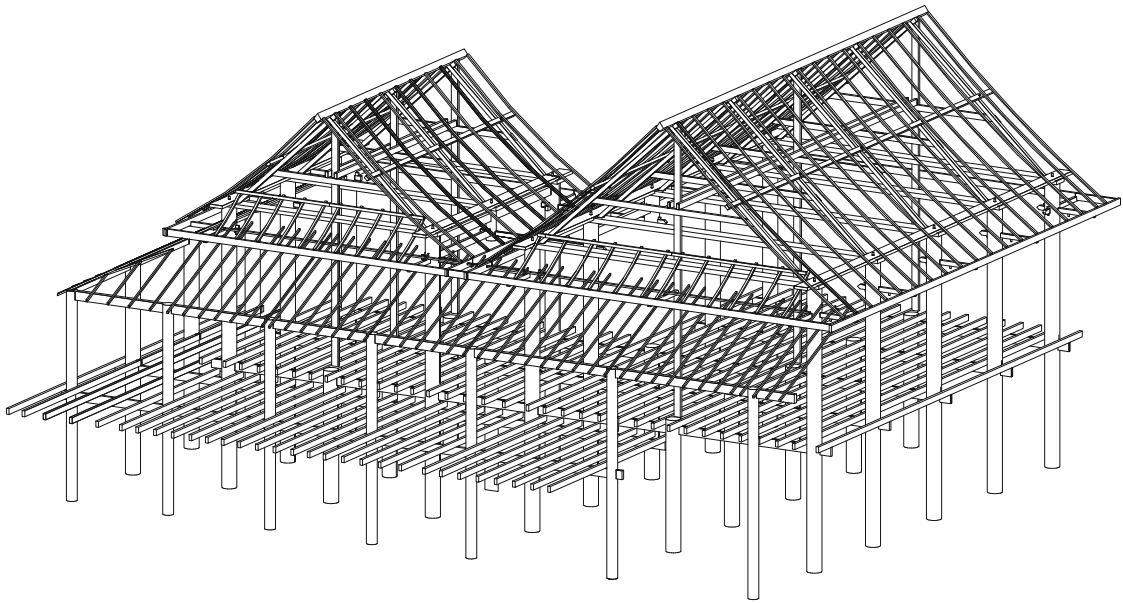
Axonometric view of the Tai Lue house showing roofs shaping member
